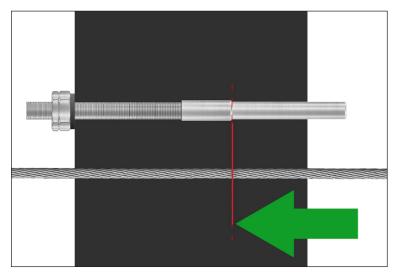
Figure K. Pull the cable tight to the back of the swage fitting. Mark and cut the cable as shown. Swage the second fitting in accordance with the swaging tool instructions.
